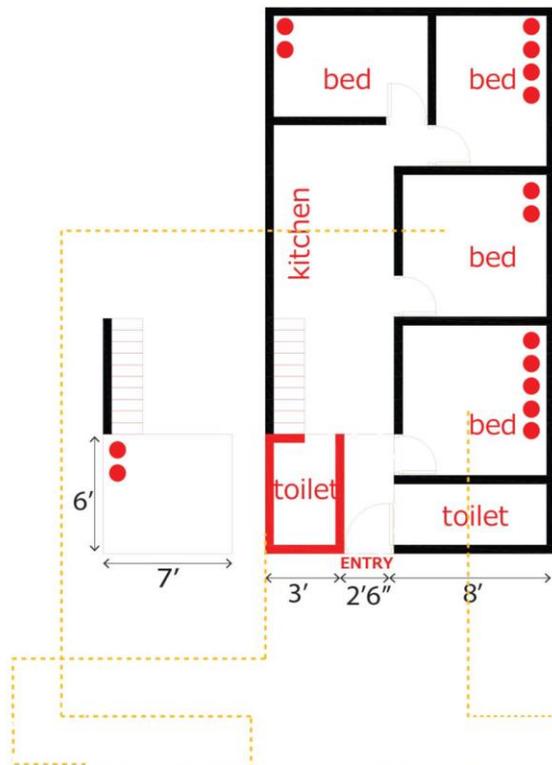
, Illustrated Plan and existing condition of dwelling type of case study 02- Ershadnagar, Gazipur6.3.
